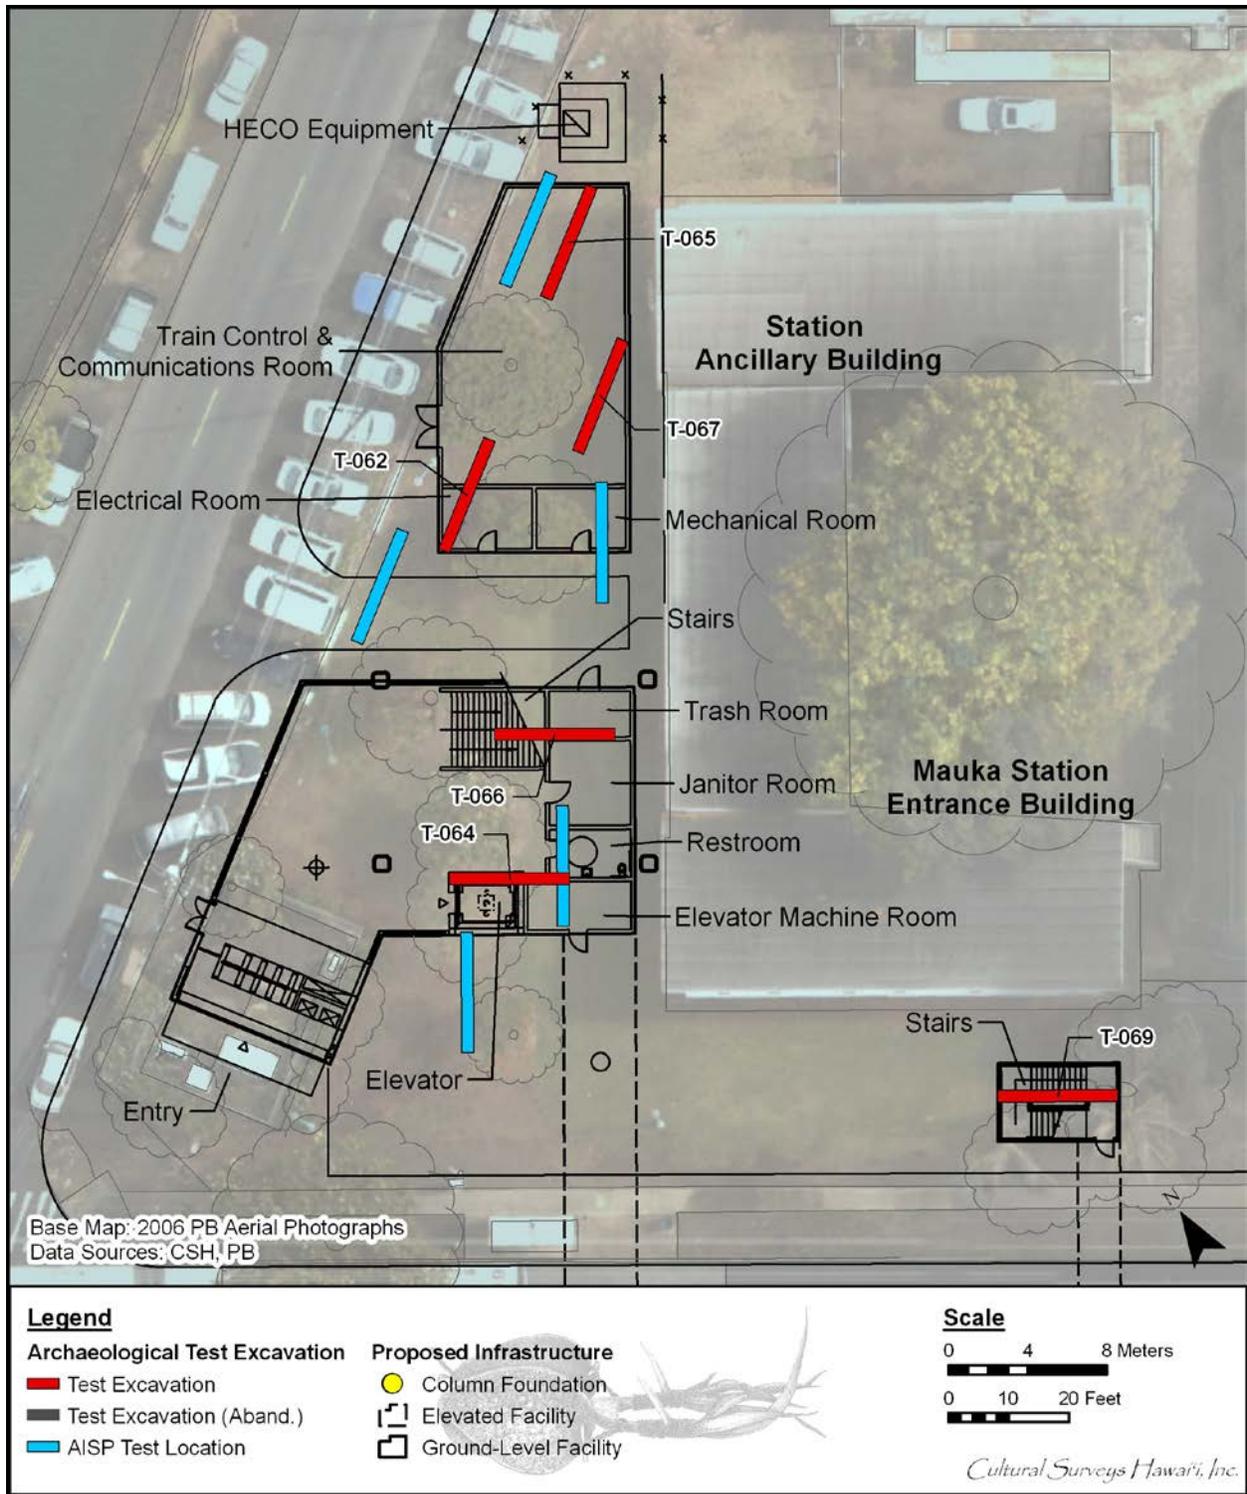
Kapālama Station, detail of (mauka) Station Entrance Building showing locations of proposed AISP and actual AIS test excavations
